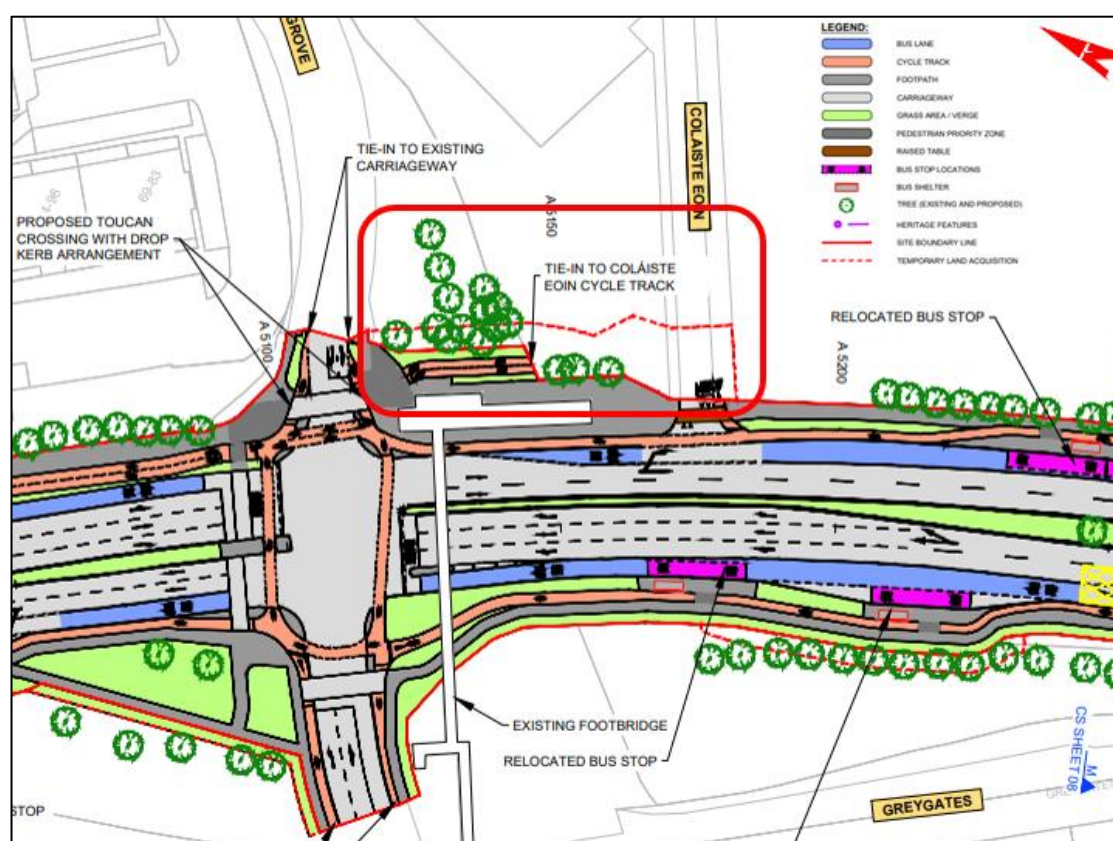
Extract from General Arrangement Drawings at Coláiste Eoin (Sheet 16)
